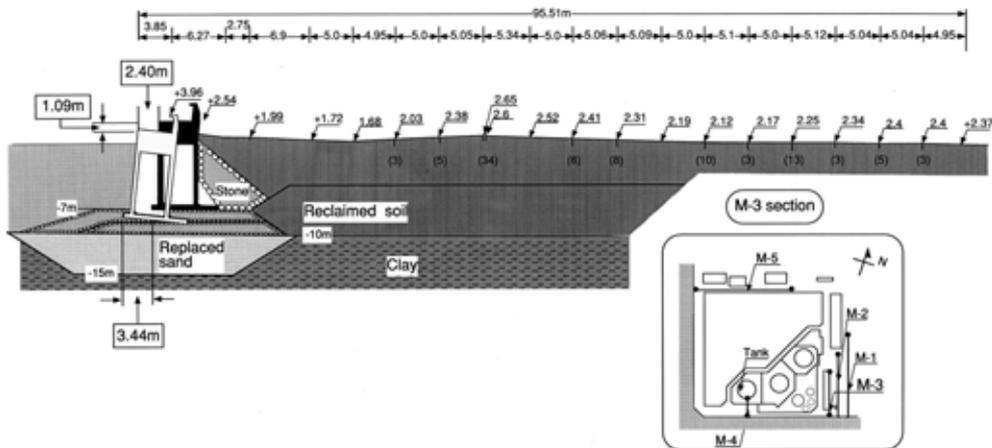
Quay wall movement and ground distortion in the backfills along section M-3
